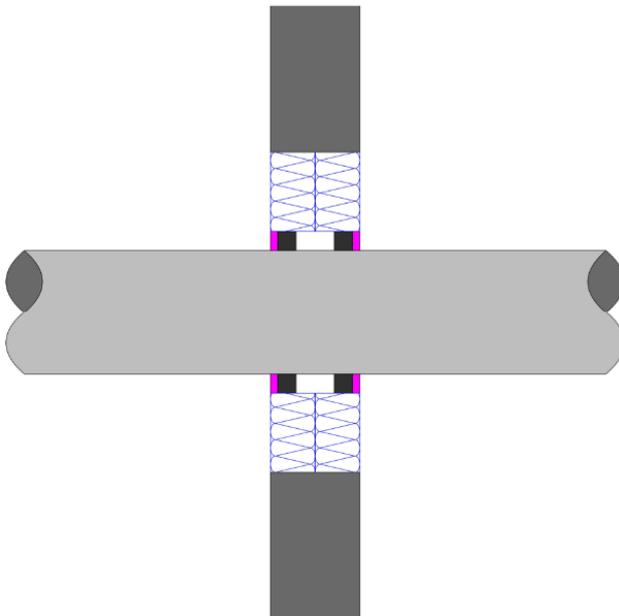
Typical installation of pipes fitted perpendicular to Batt sealing an aperture in a wall with BOSS UniWrap on both faces
